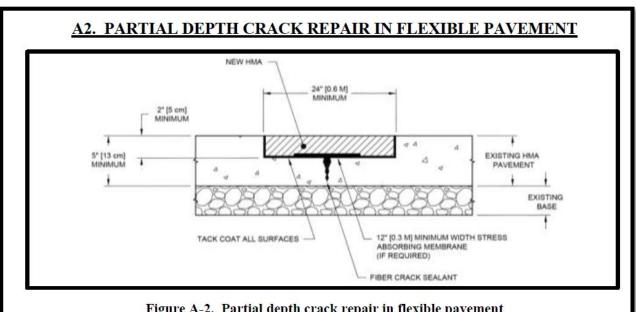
Partial depth crack repair in flexible pavement
